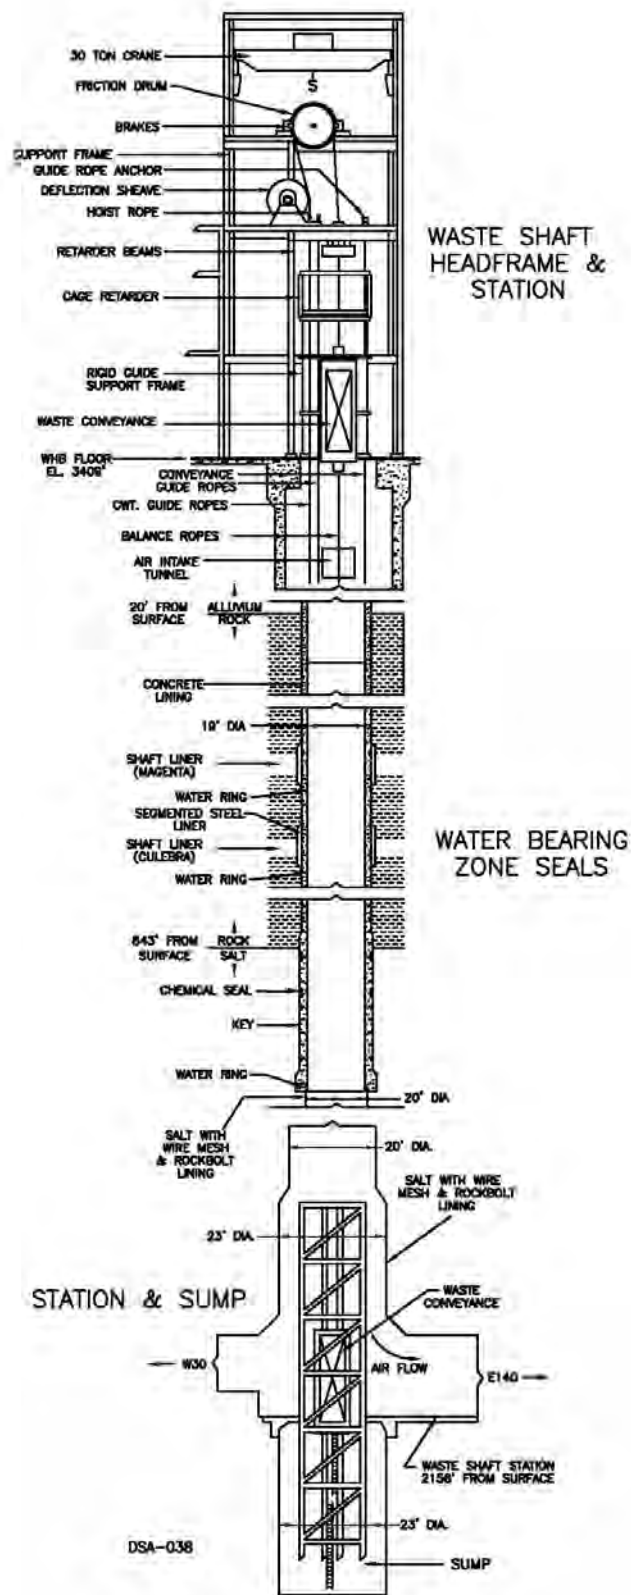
Waste Shaft, Hoist, and Conveyance Arrangement
